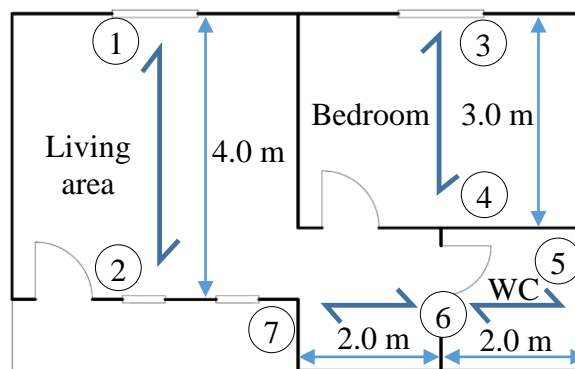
Basic floor plan of the idealised 3DP cob house. Half-headed arrows indicate the span direction of the suspended floor and roof. Loadbearing walls are numbered from 1 to 7.
